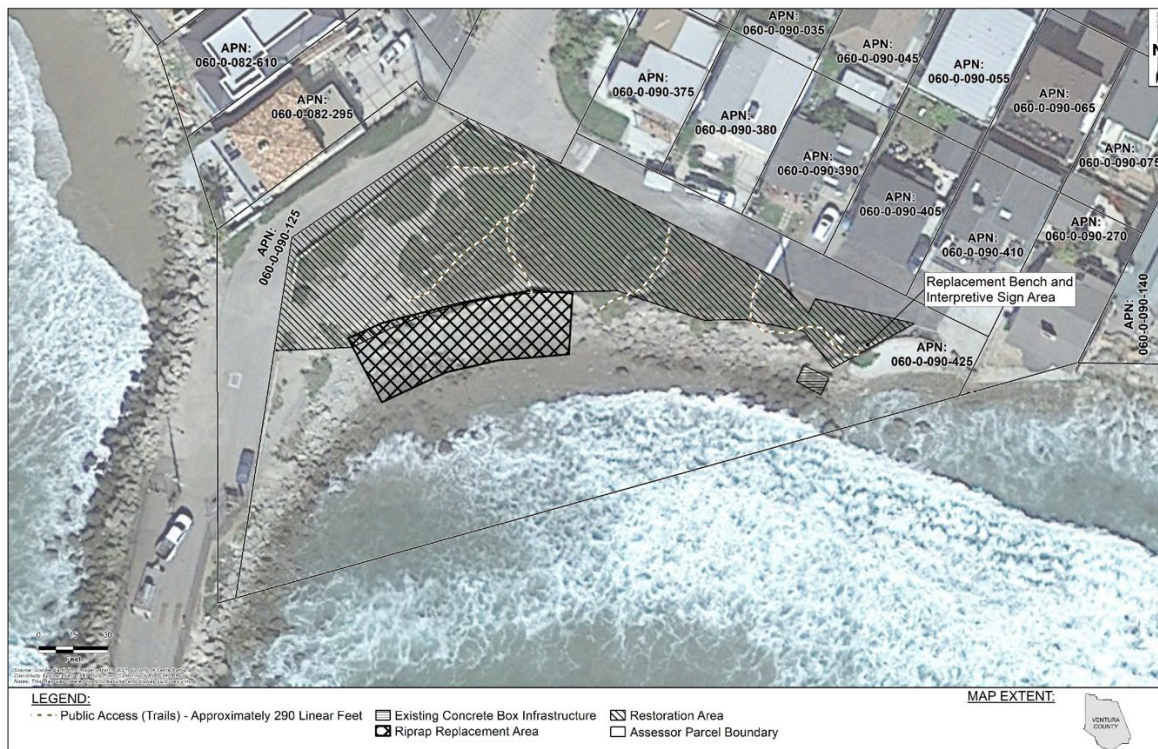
Details of placement of riprap for Alternative Plan 9c.
